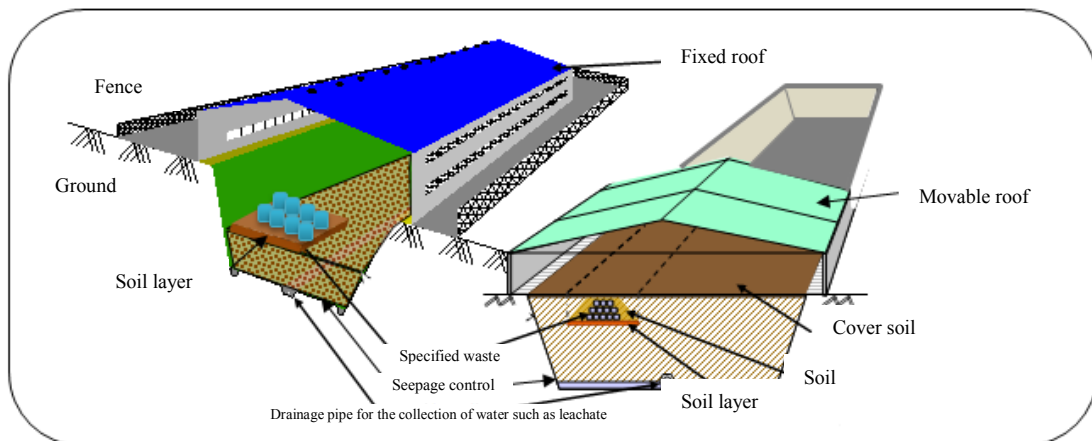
Landfill Disposal at the Roofed Final Landfill Site (Example)
